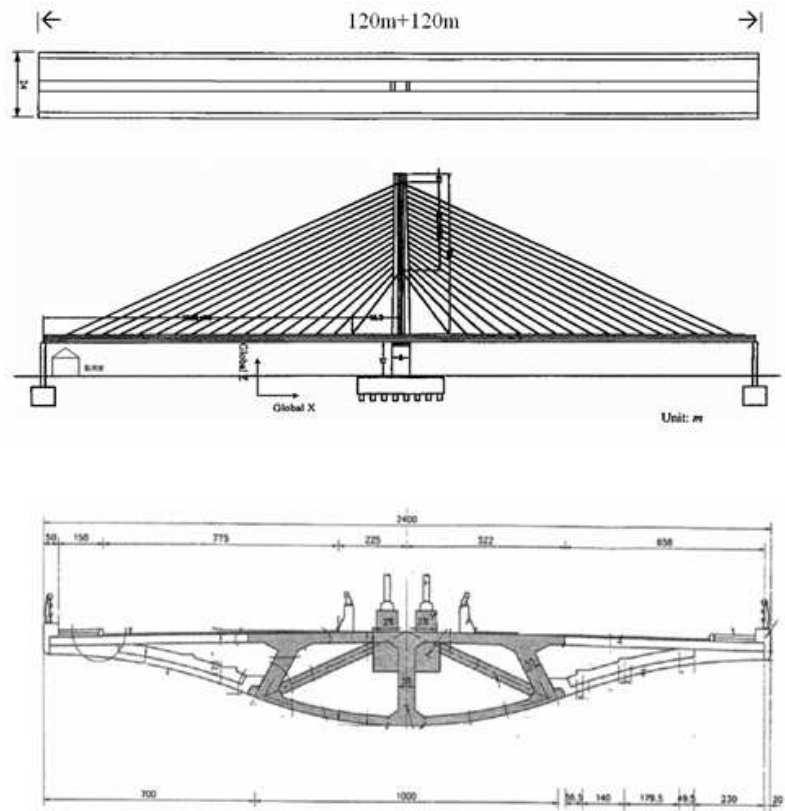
Profile of Chi-Lu Cable-Stayed Bridge
